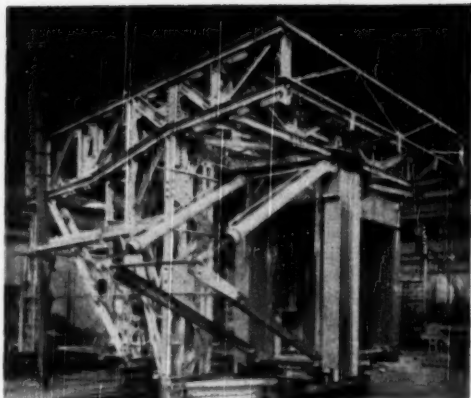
SHORE STATION, SHOWING PAIR OF ROTATING TURRETS OF NEW TELESCOPIC GANGWAYS
